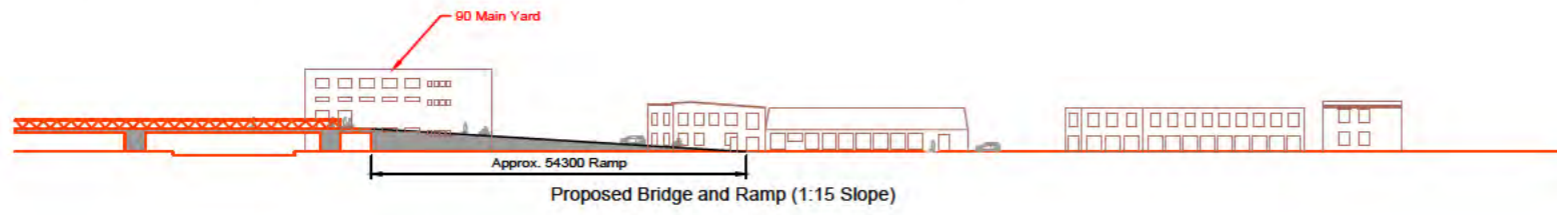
Wallis Road ped/cycle bridge Option D
